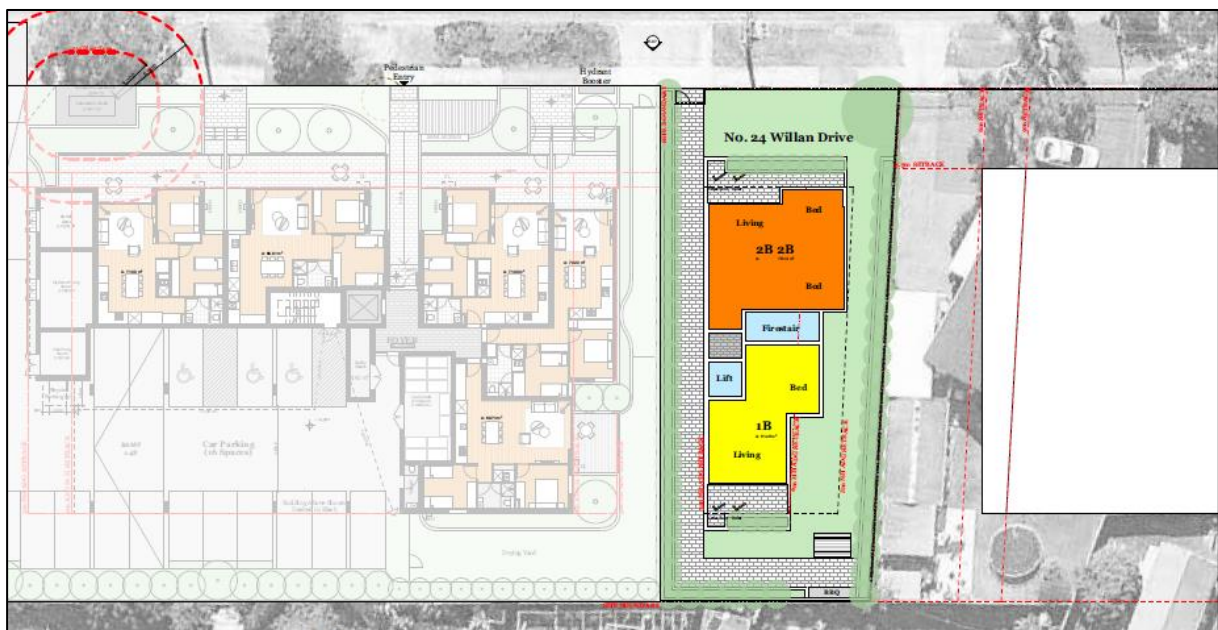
Concept Building Envelope Plan for 24 Willan Drive.
